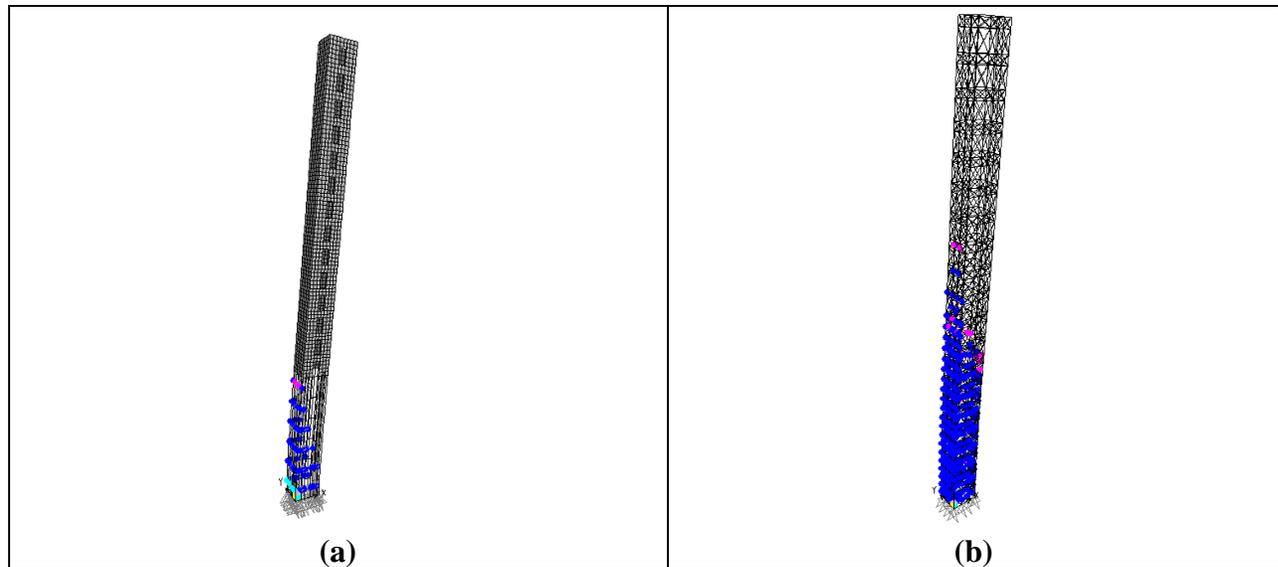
(a) Hinge formation in core wall (Fiber or frame model); (b) Hinge formation in core wall (Strut and tie model)
